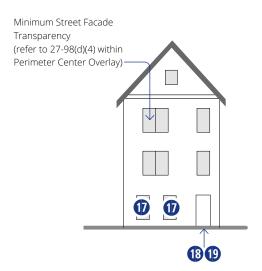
Detached House Building: Street Facade Design Requirements
